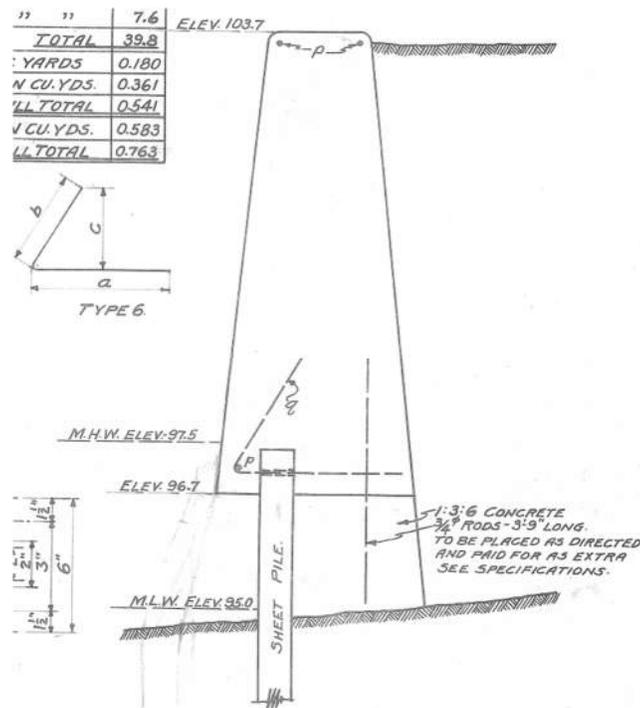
Wall detail from 1926 Plans for Concrete Seawall
